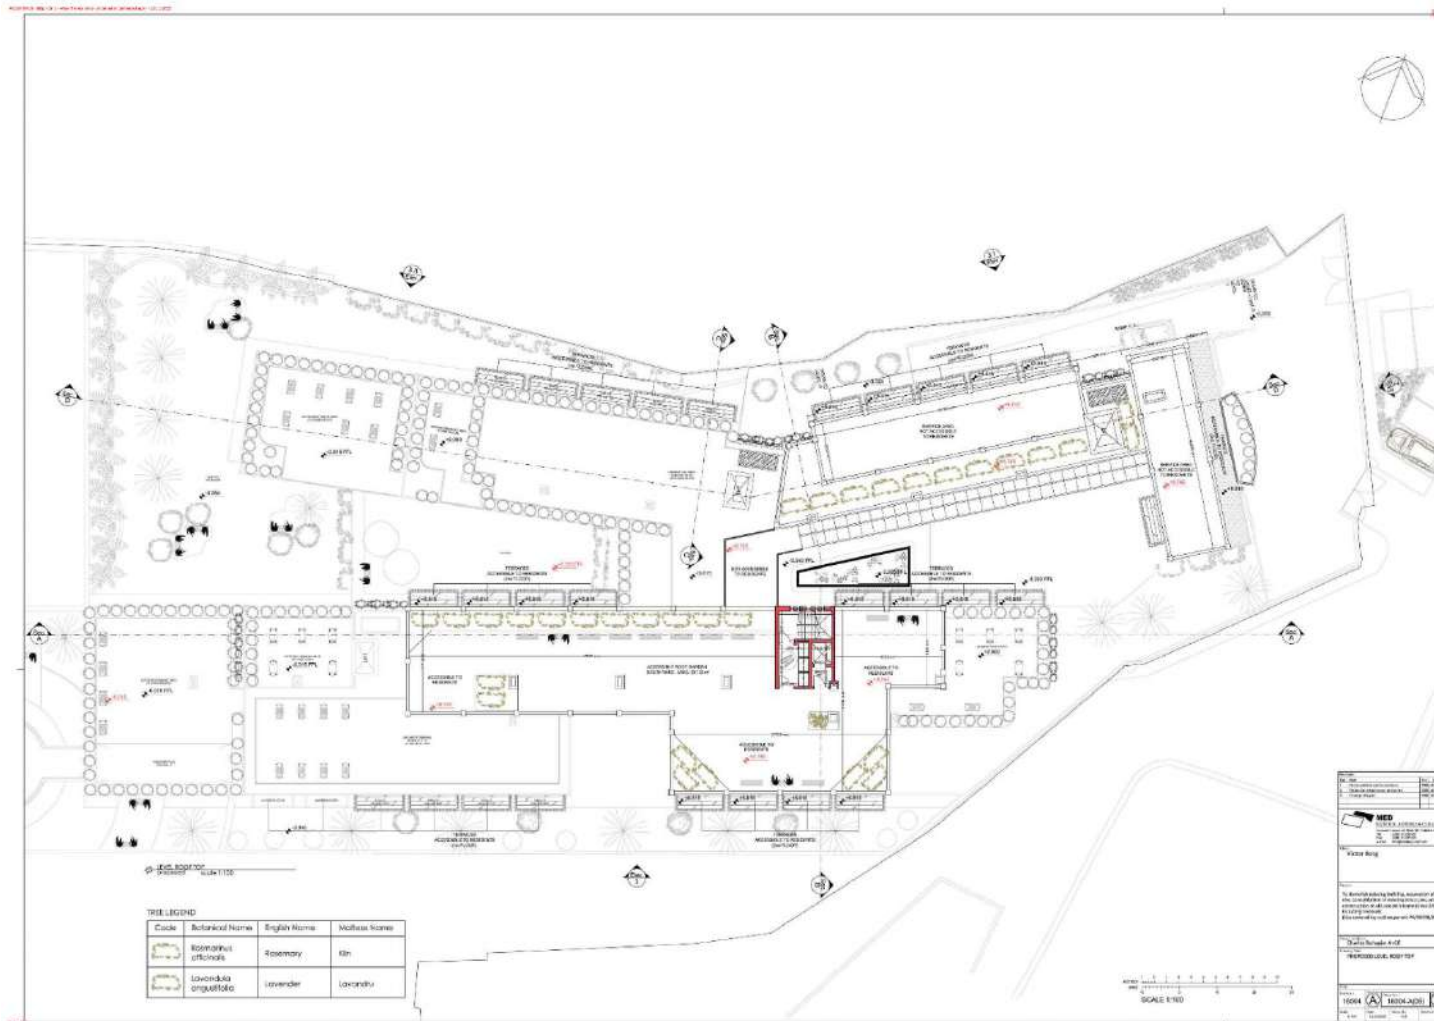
PROPOSED ROOF LEVEL PLAN
